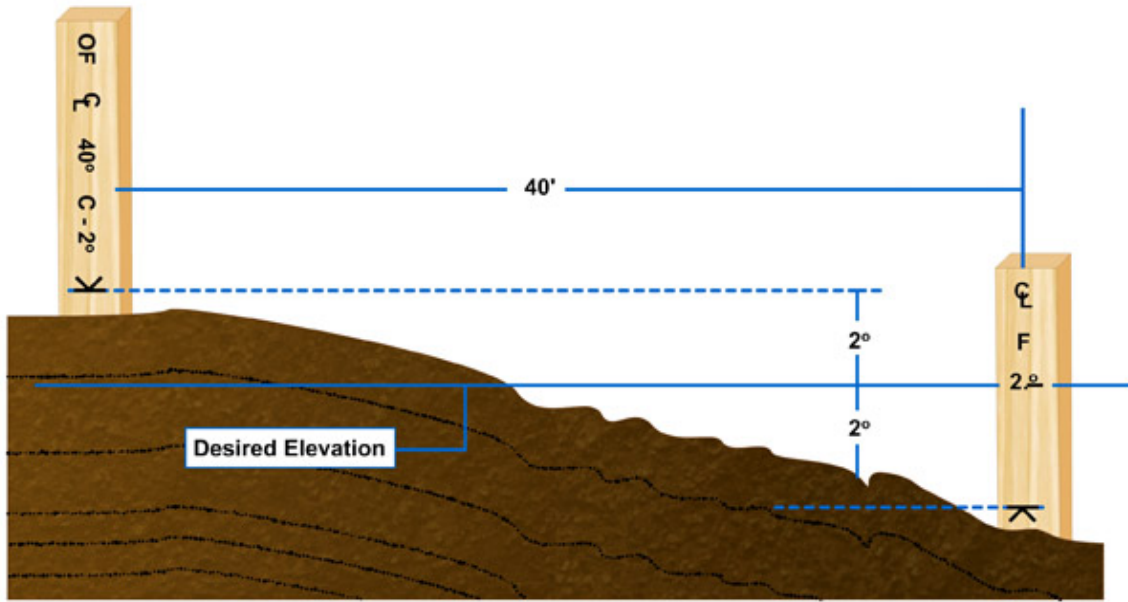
Difference in elevation between the offset stake crowfoot and desired grade at center stake.
